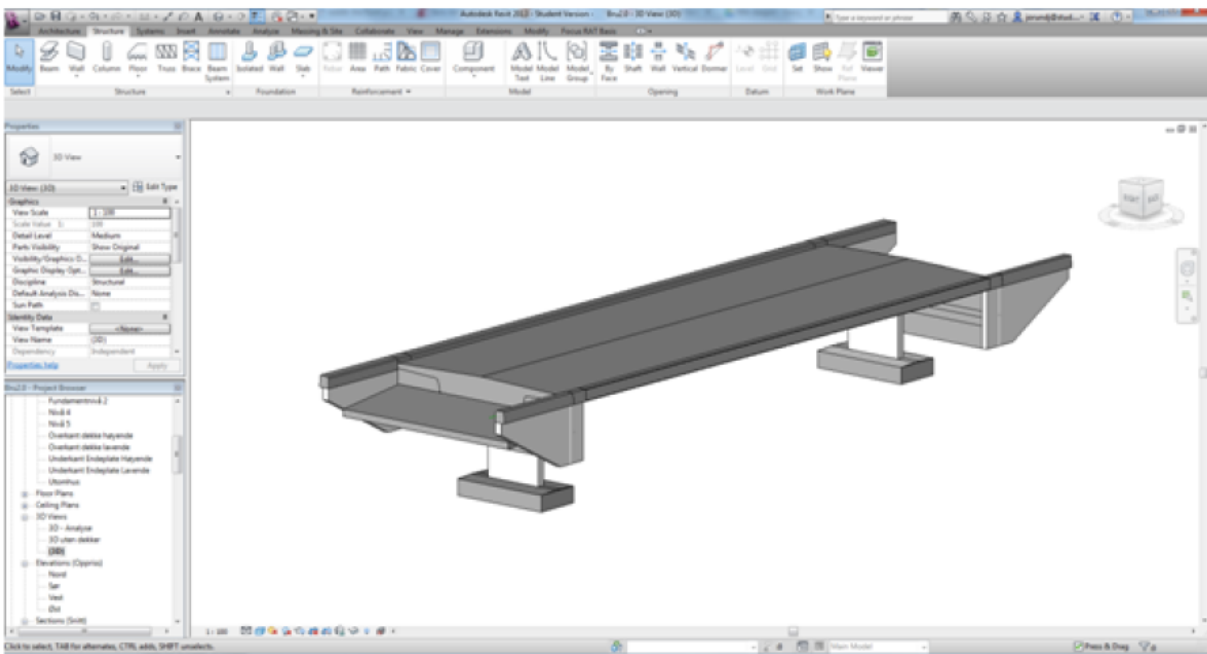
Bridge design work (*Autodesk Revit*)
